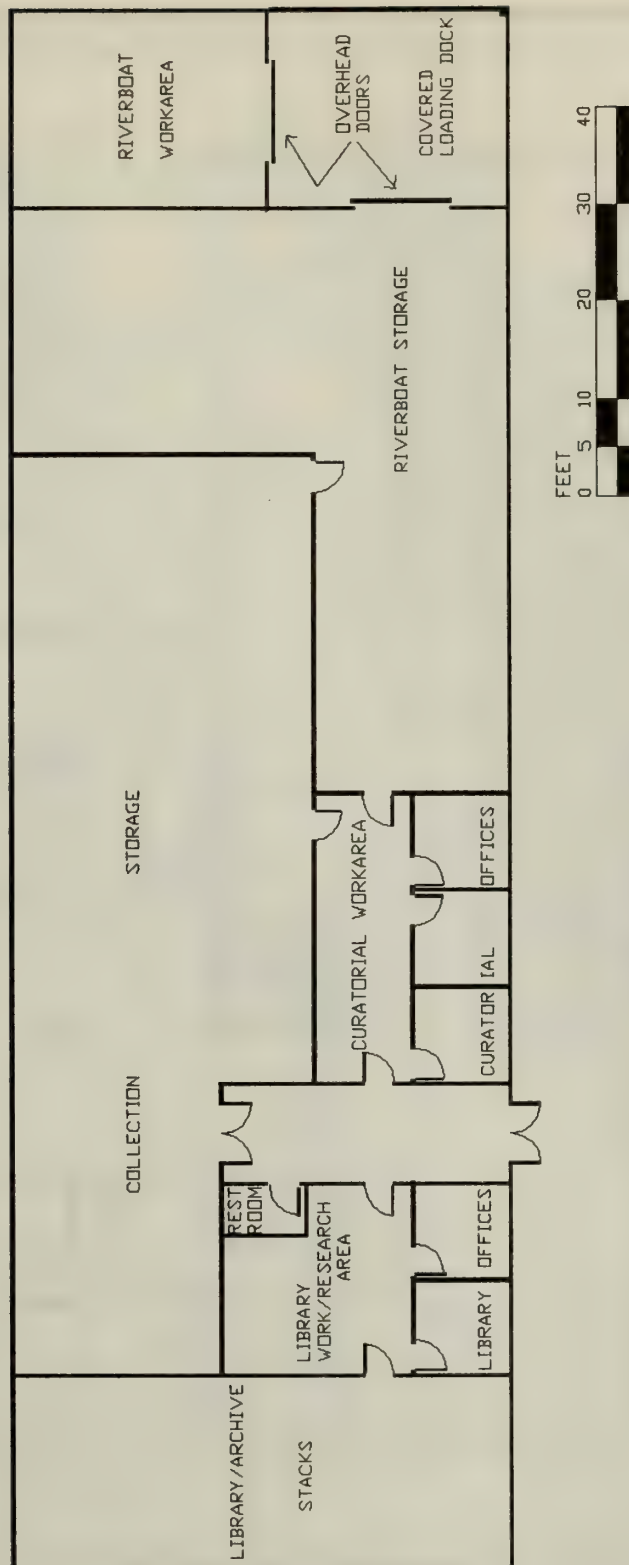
General Floor Plan of Proposed Museum Collection and Library Center at Grand Canyon National Park.
